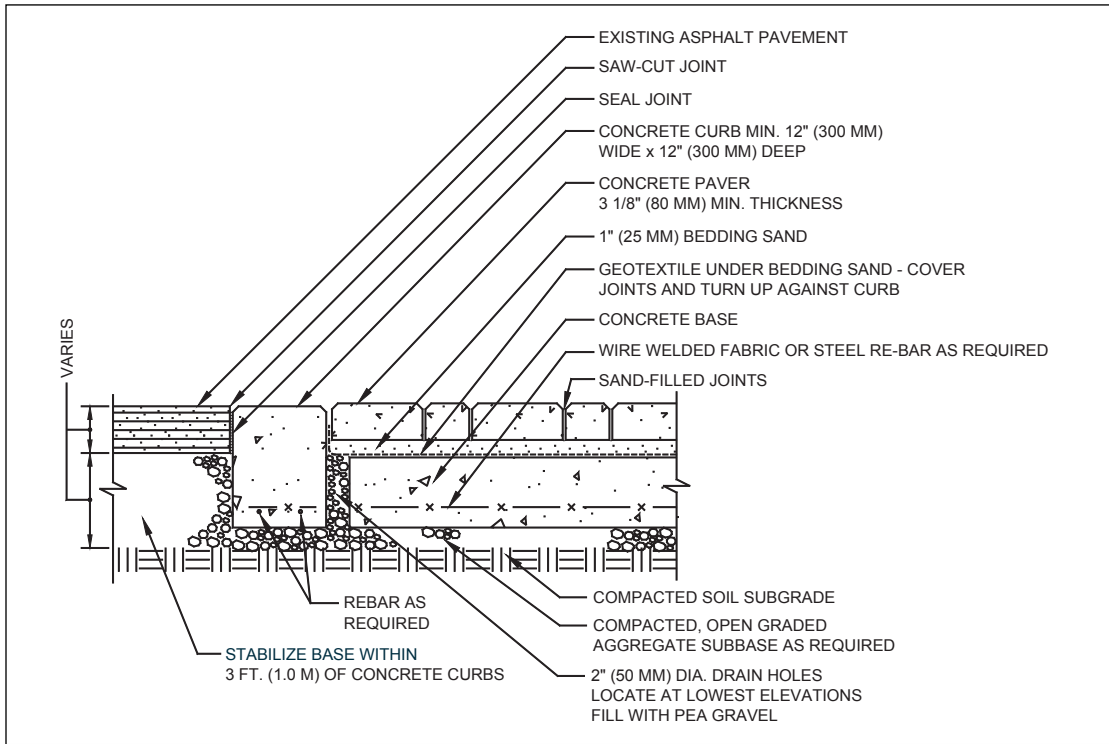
Detail for sand set pavers over a concrete base crosswalk. Holes provide drainage for water that enters the bedding layer. The same detail applies for paver overlays on asphalt.
